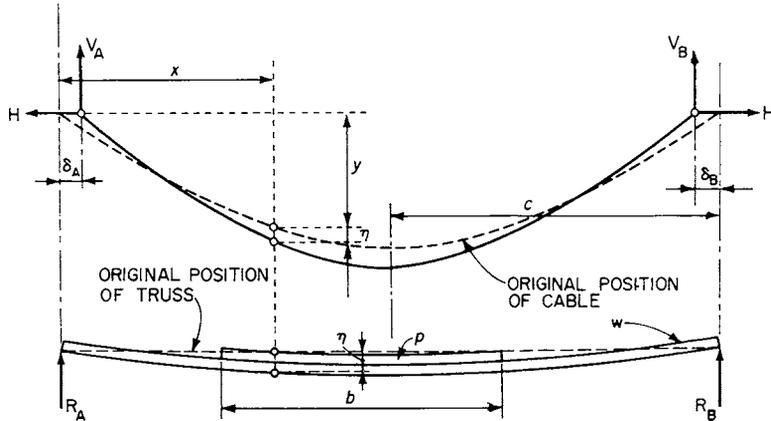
Original and deflected positions of the main-span cable and stiffening truss for the bridge in Fig. 15.41. Cable and truss have equal deflections at distance x from a pylon.
